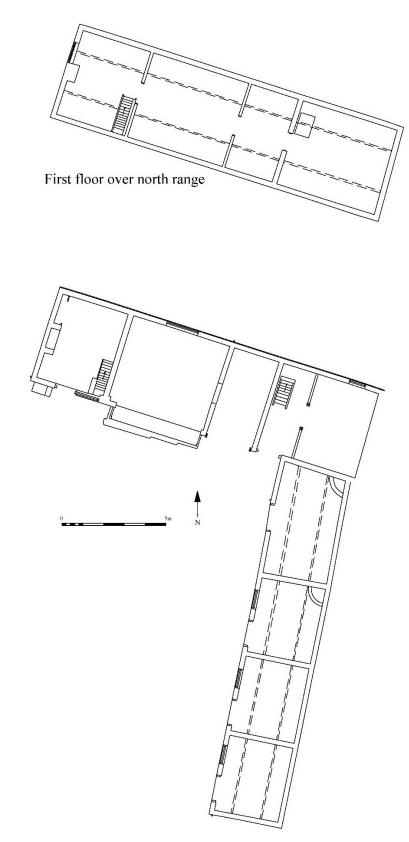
Former stable buildings, plans Modified from plans supplied by client
